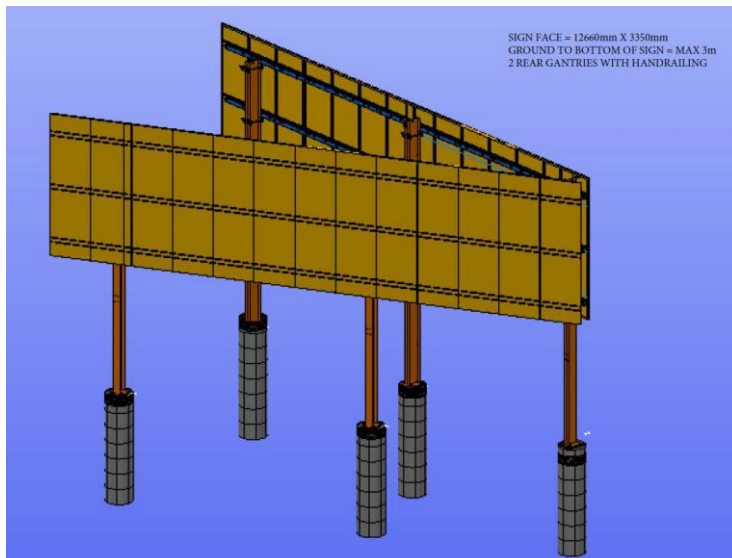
Illustration of proposed sign (Outdoor Fabrications)
